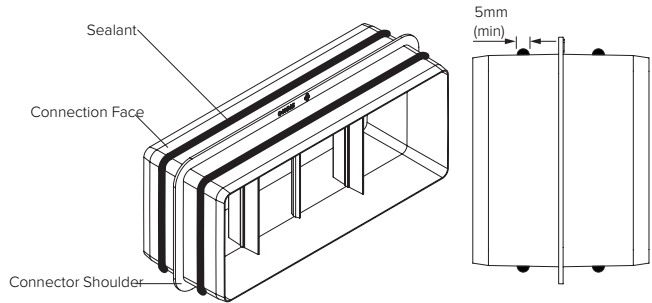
FITTING RECTANGULAR AND CIRCULAR DUCT CLAMP
